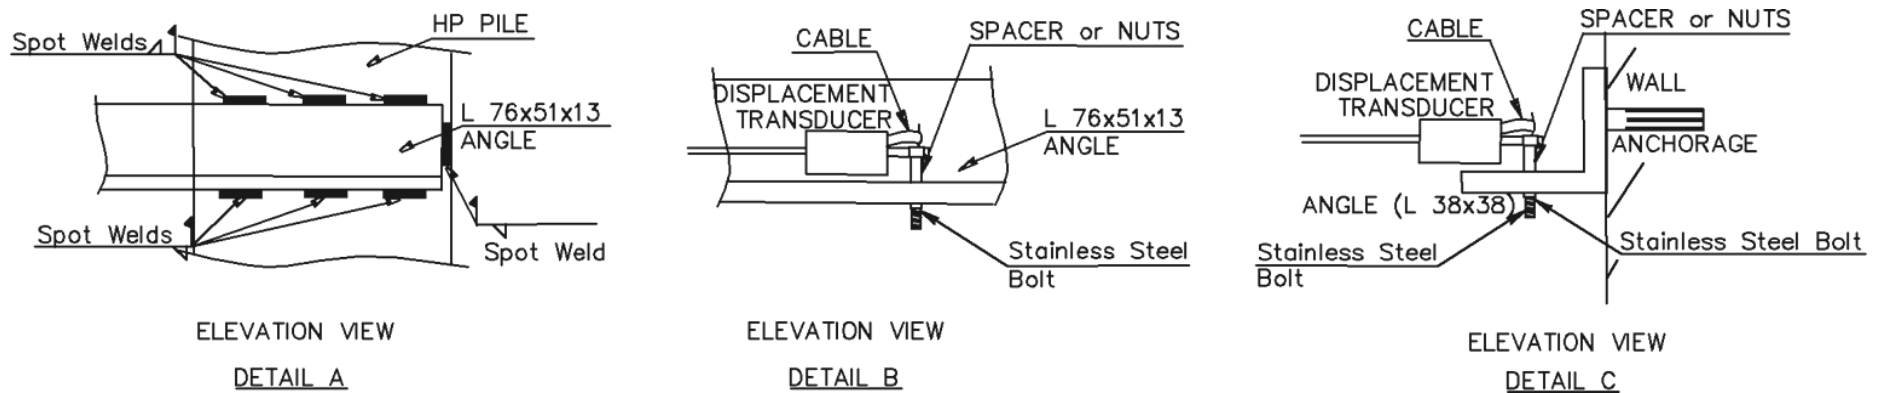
Connection Details for Displacement Transducers at the Stockbridge Bridge
